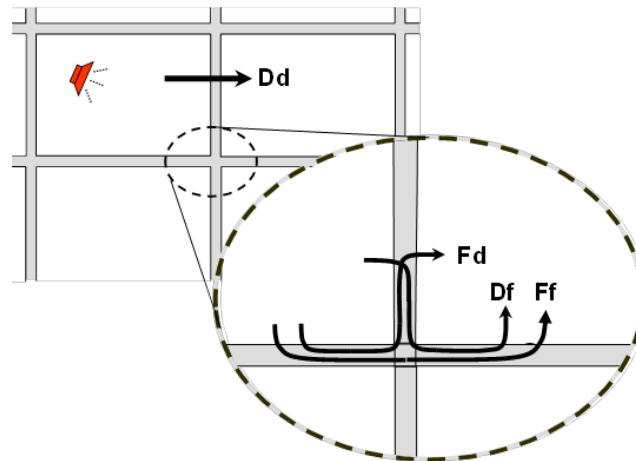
Direct and flanking sound transmission for the floor–wall junction between two side-by-side rooms (path naming convention according to ISO 15712: “D”, “d”: direct element; “F”, “f”: flanking element; Source room: Capital letter; Receiving room: lowercase).
